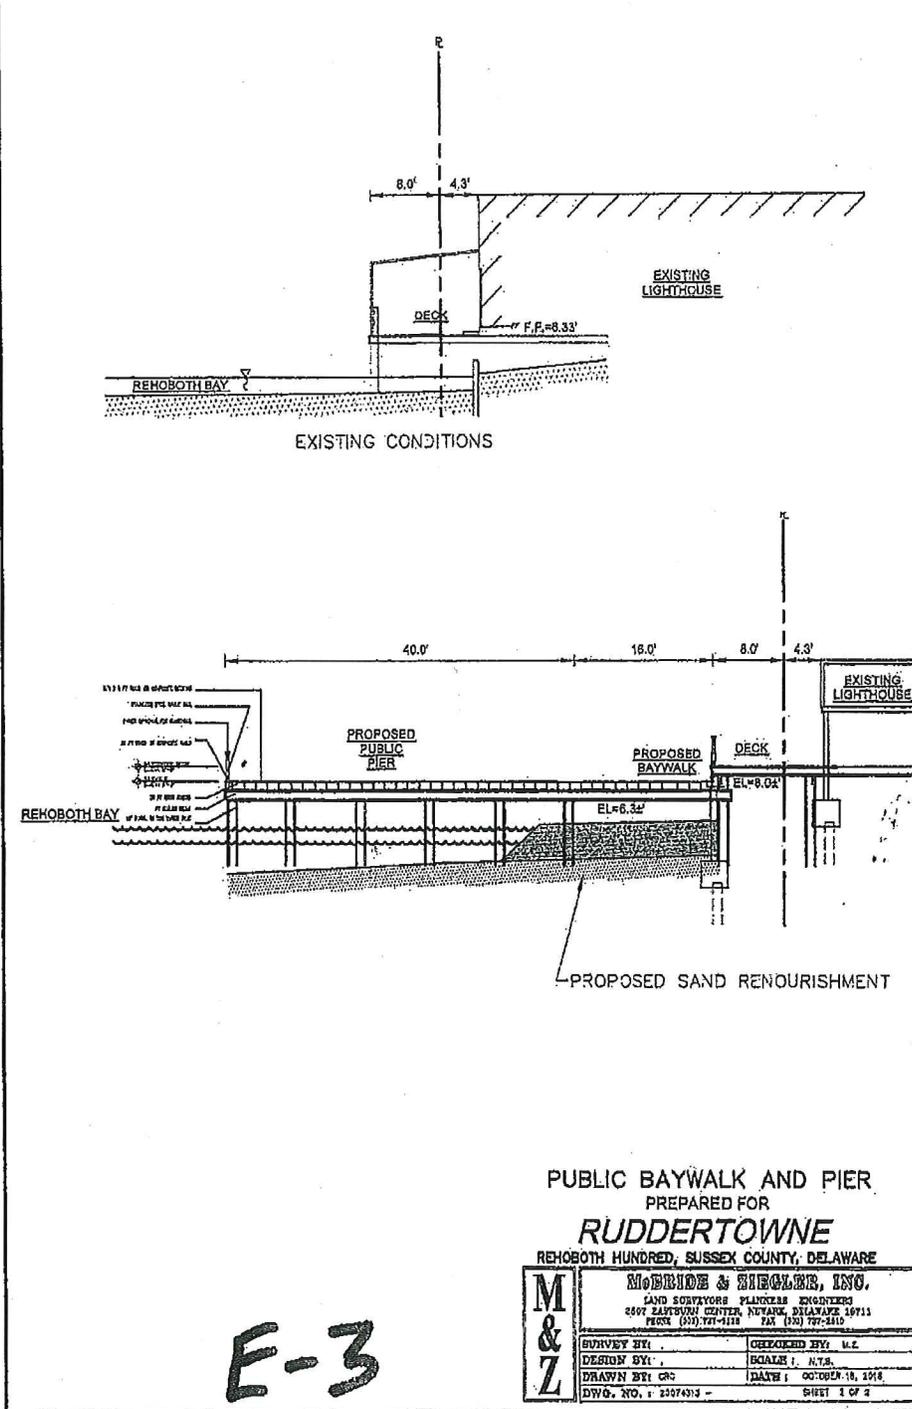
Cross-sections of existing conditions and proposed project (prepared by McBride & Ziegler, Inc.). Application for proposed sand renourishment shown on plan was submitted to Corps on December 28, 2017. 2019-194
